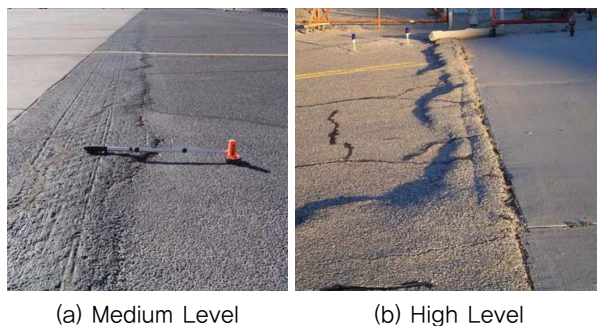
Asphalt Shoving Occurred at Pavement Junction
